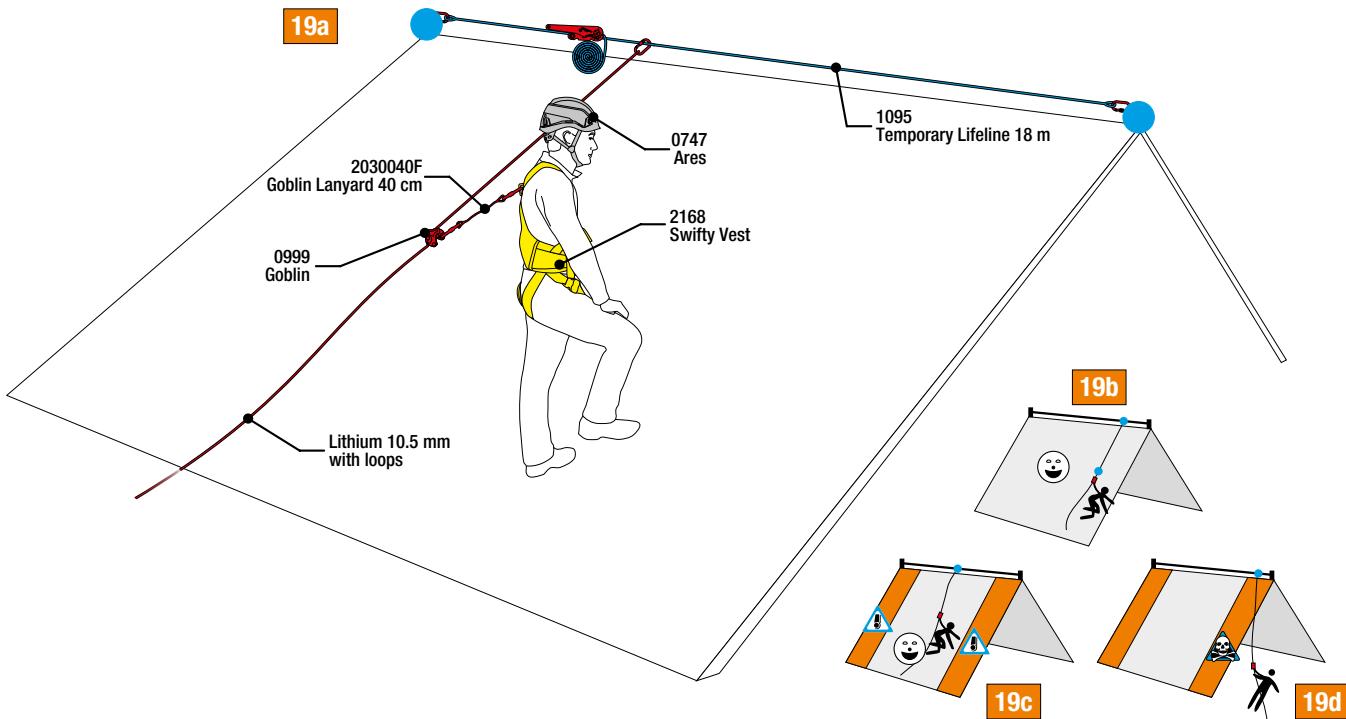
On roofs and terraces, horizontal anchoring lines (which can be permanent or temporary) or individual anchoring points can be used.
